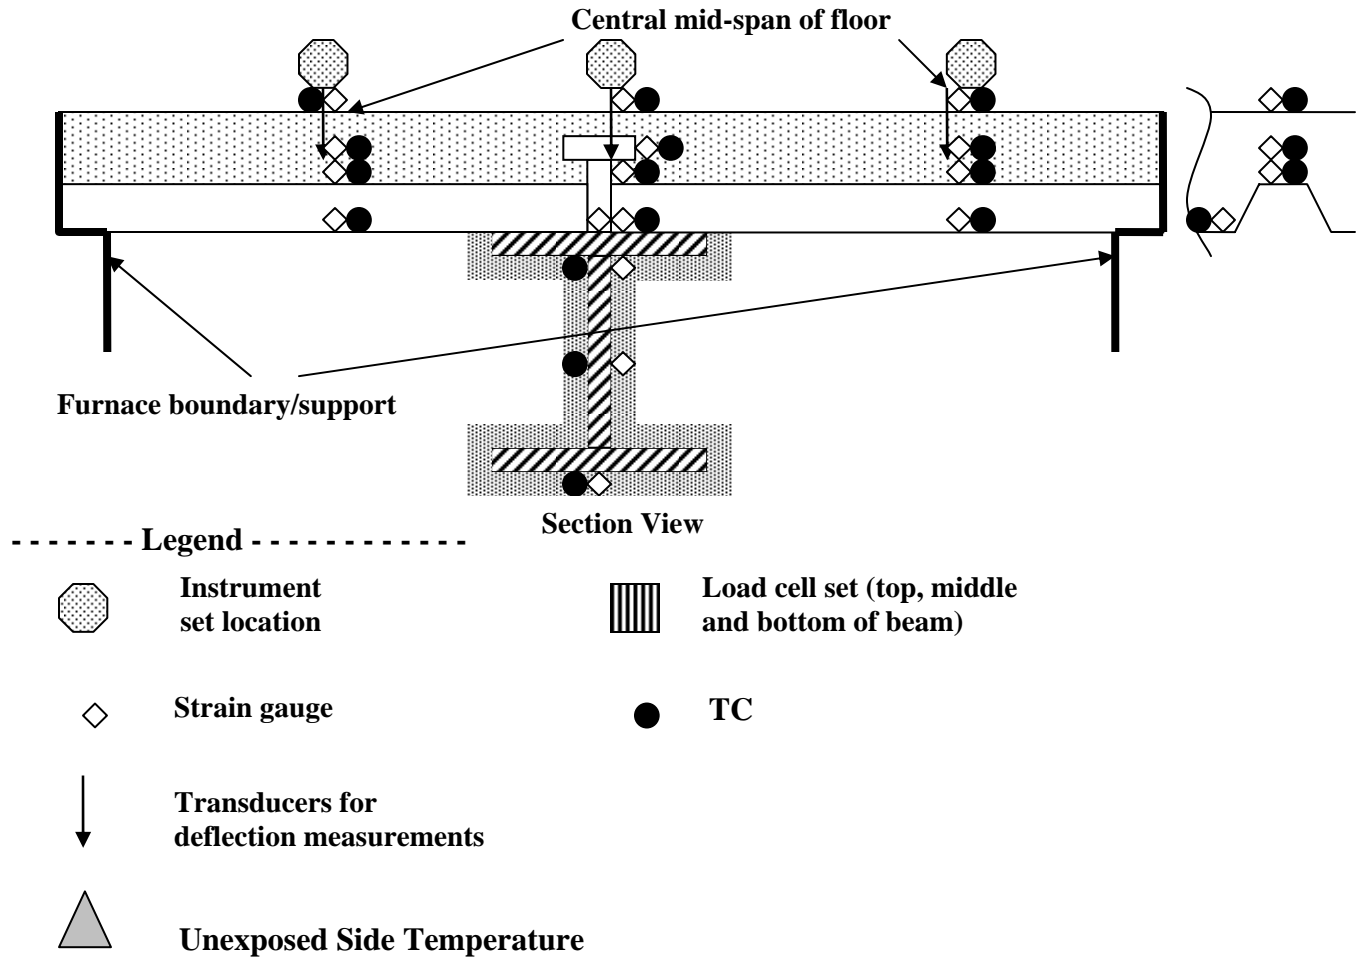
Schematic section view of instrumentation set locations for deflections, strain gauges, and thermocouples of floor assembly.
